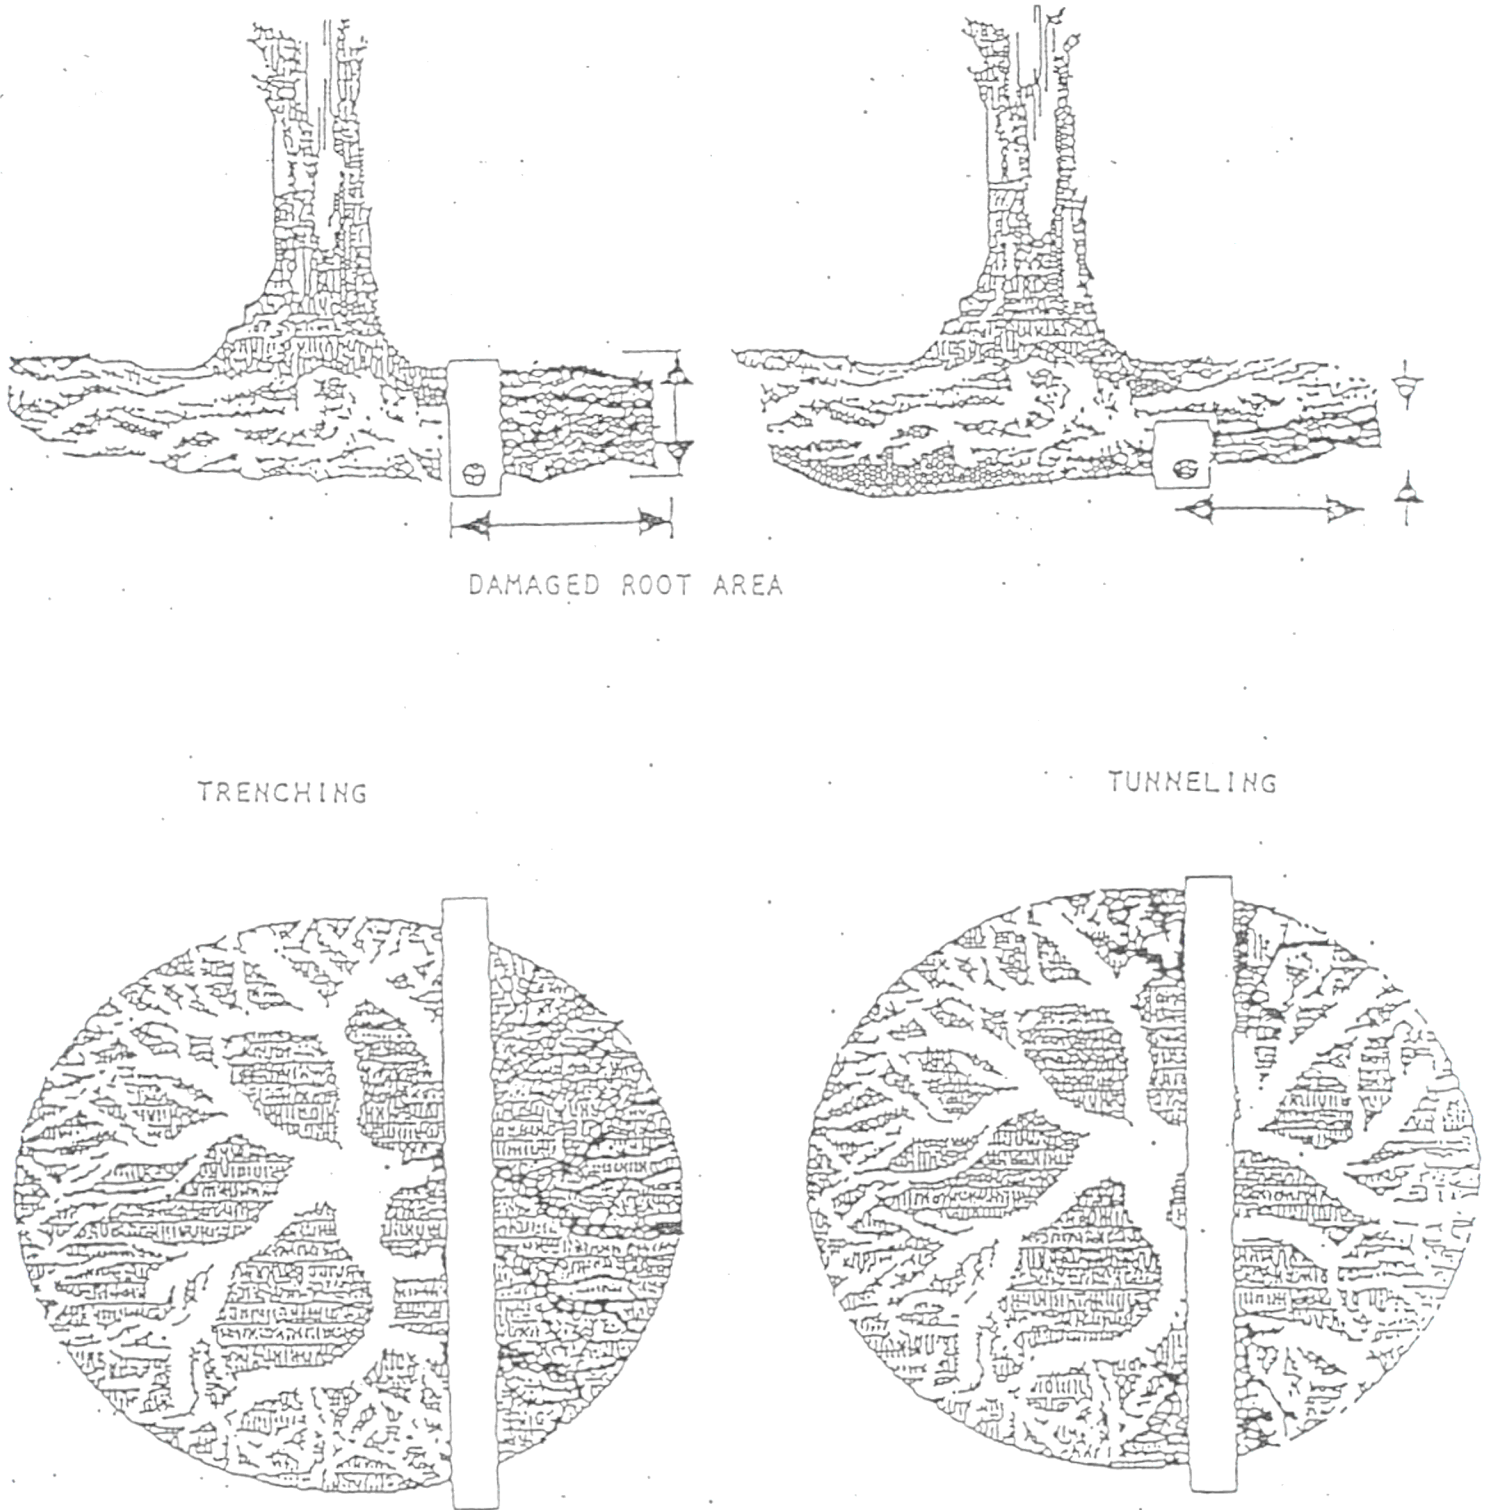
ROOT LOSS FROM TRENCHING VERSUS TUNNELING
